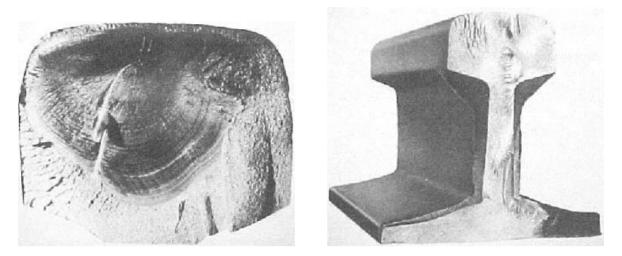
411 - WELDING, FLASH BUTT JOINT, TRANSVERSE CRACK
